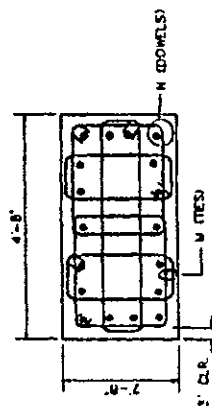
Foundation Plan and Details (Sheet 2 of 2)
